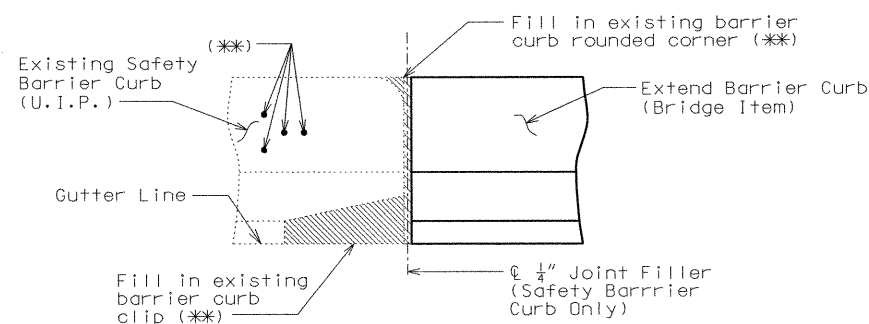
DETAIL SHOWING BRIDGE ANCHOR SECTION AT RIGHT SAFETY BARRIER CURB
